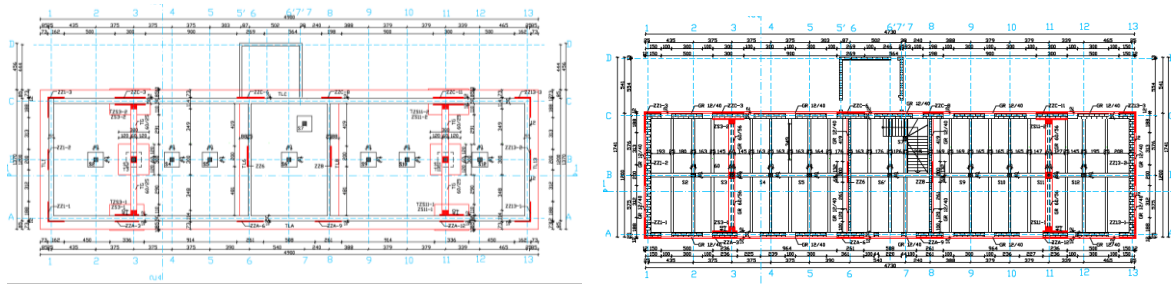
Strengthened and existing state at plan of foundations (left), ground floor and storey (right)
